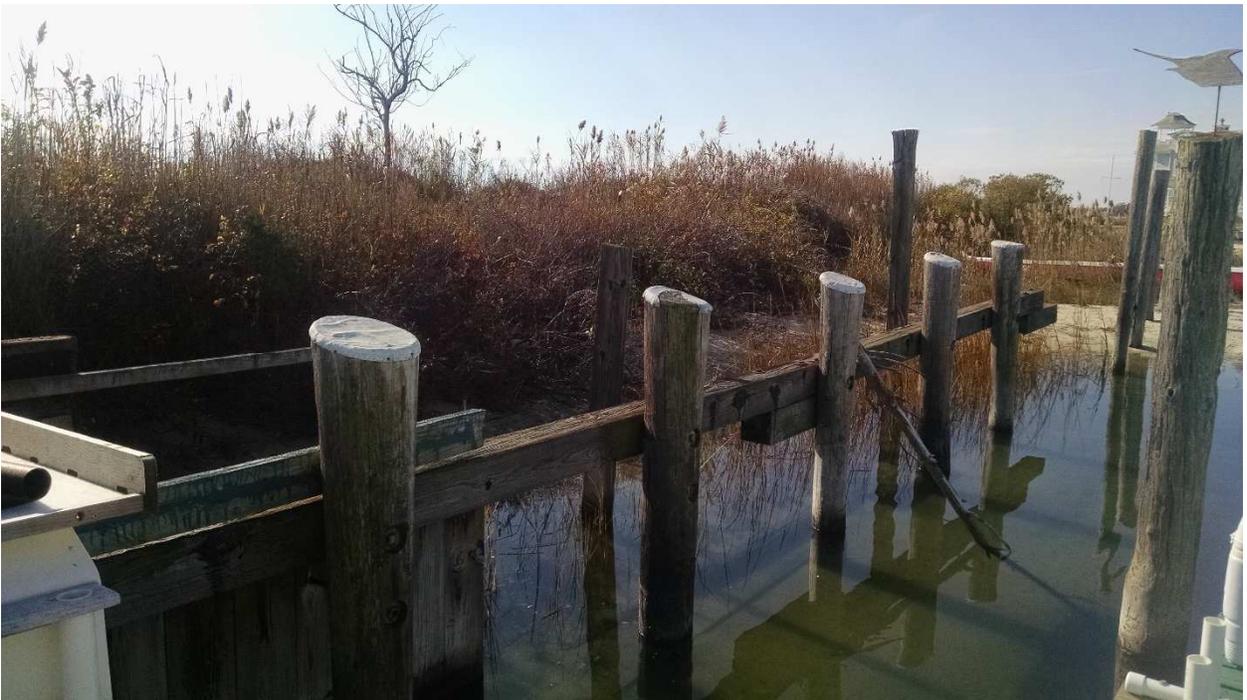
Facing Southwest. Bulkhead area on southern portion of basin to be replaced.
